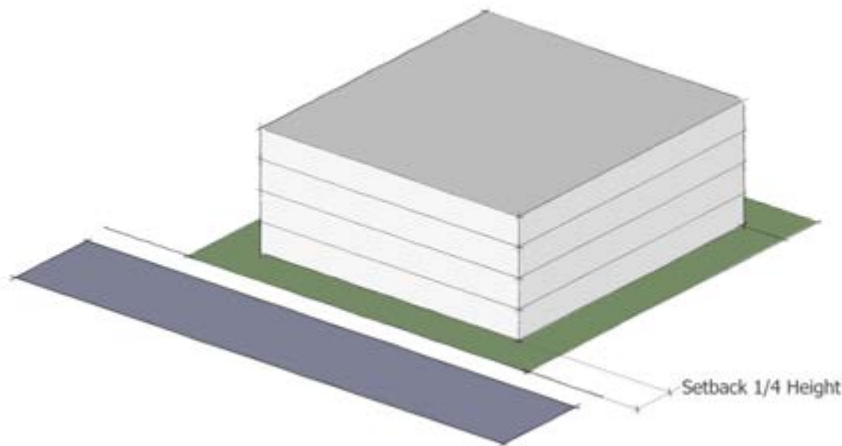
b – Setbacks for buildings greater than four storeys adjacent to a non-residential zone
